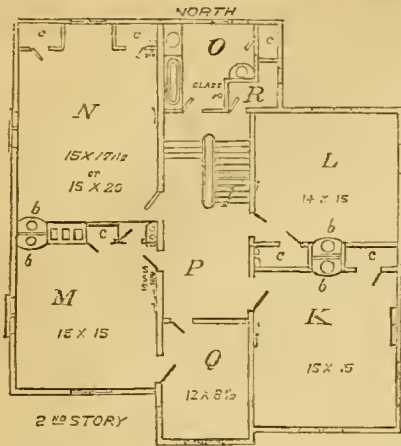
SECOND STORY.—Height 9 1/4 feet in clear. *K* and *L*, Chamber Parlors, or Bedrooms. *M*, Family Bedroom, with Speaking-Tubes to Kitchen, Dining-Room, and to bell-pull outside front Door; and bells to basement Hall, and Attic Hall for summoning and waking servants. . . . *Q*, for Dressing Room, or Bedroom, or Sewing Room, or Nurse's Room, as required. . . . *N*, Large Bedroom with closets, *c*, *c*, *c*. . . . *O*, Bath-room, with bathing-tub, marbleized iron wash-stand, water-closet, closet, register, gas, obscured ornamental glass doors, etc. *P*, Main Chamber Hall, 8 1/2 feet wide; *R*, rear stairs Hall. All chamber rooms have wash-basins (*b*, *b*, *b*, *b*) in alcoves, with Italian marble tops and wall-protectors, plated hot and cold water self-acting cocks, registers, (*r*, *r*, *r*, *r*, *r*), closets, (*c*, *c*, *c*, *c*, *c*, *c*), double wall ventilators, bells, and *T*, *M*, and *N*, have Italian Marble Mantels, with Summer pieces, having German-silver guards, etc.
